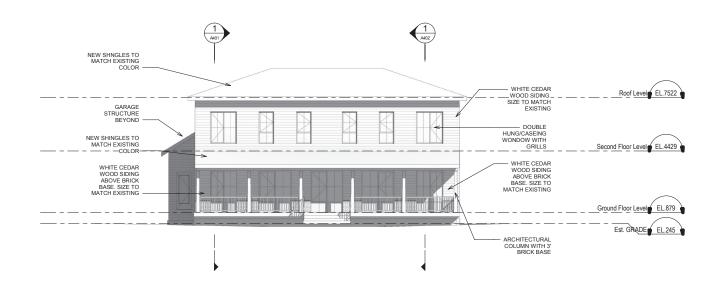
Rear/North Elevation. New Addition at rear. Drawing by Third Layer Architects, 2021.
